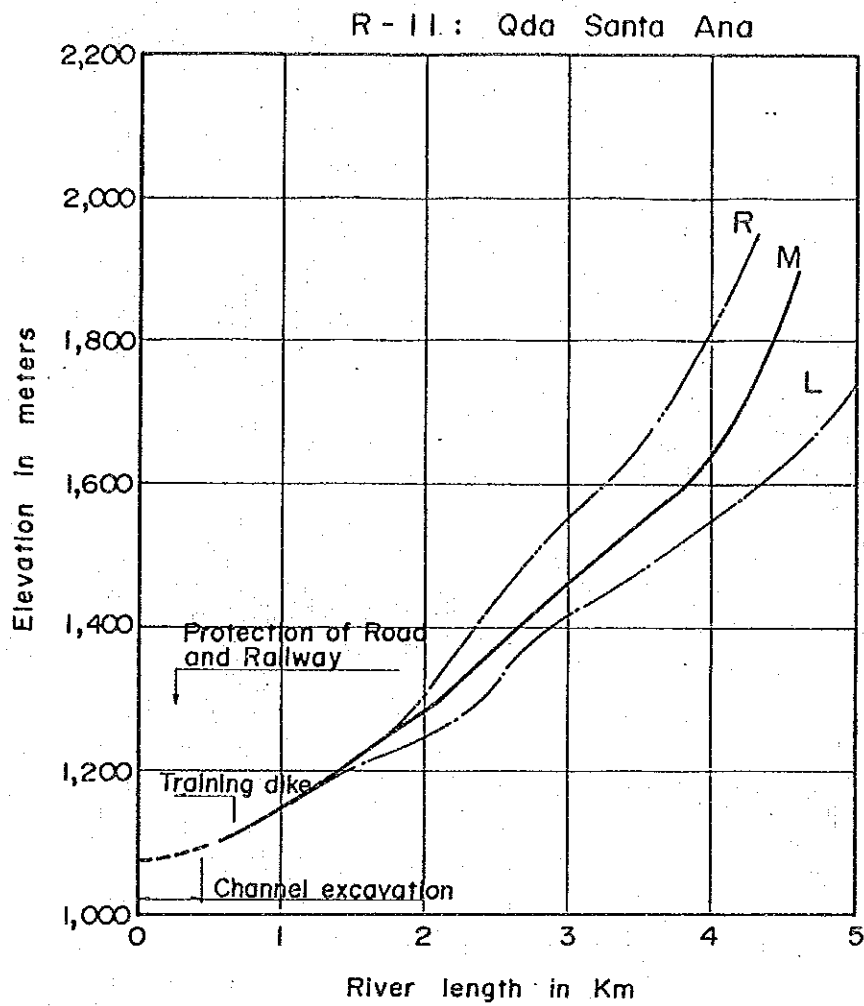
Structural Plan on Profile of Qda Santa Ana (R11)
